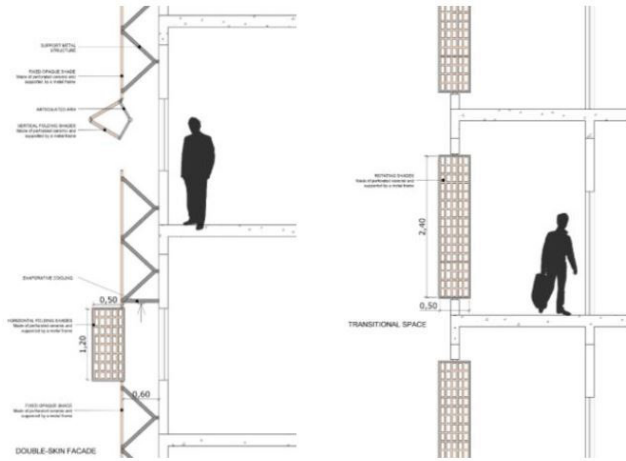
Double-Skin Facade section - Horizontal and vertical shade
